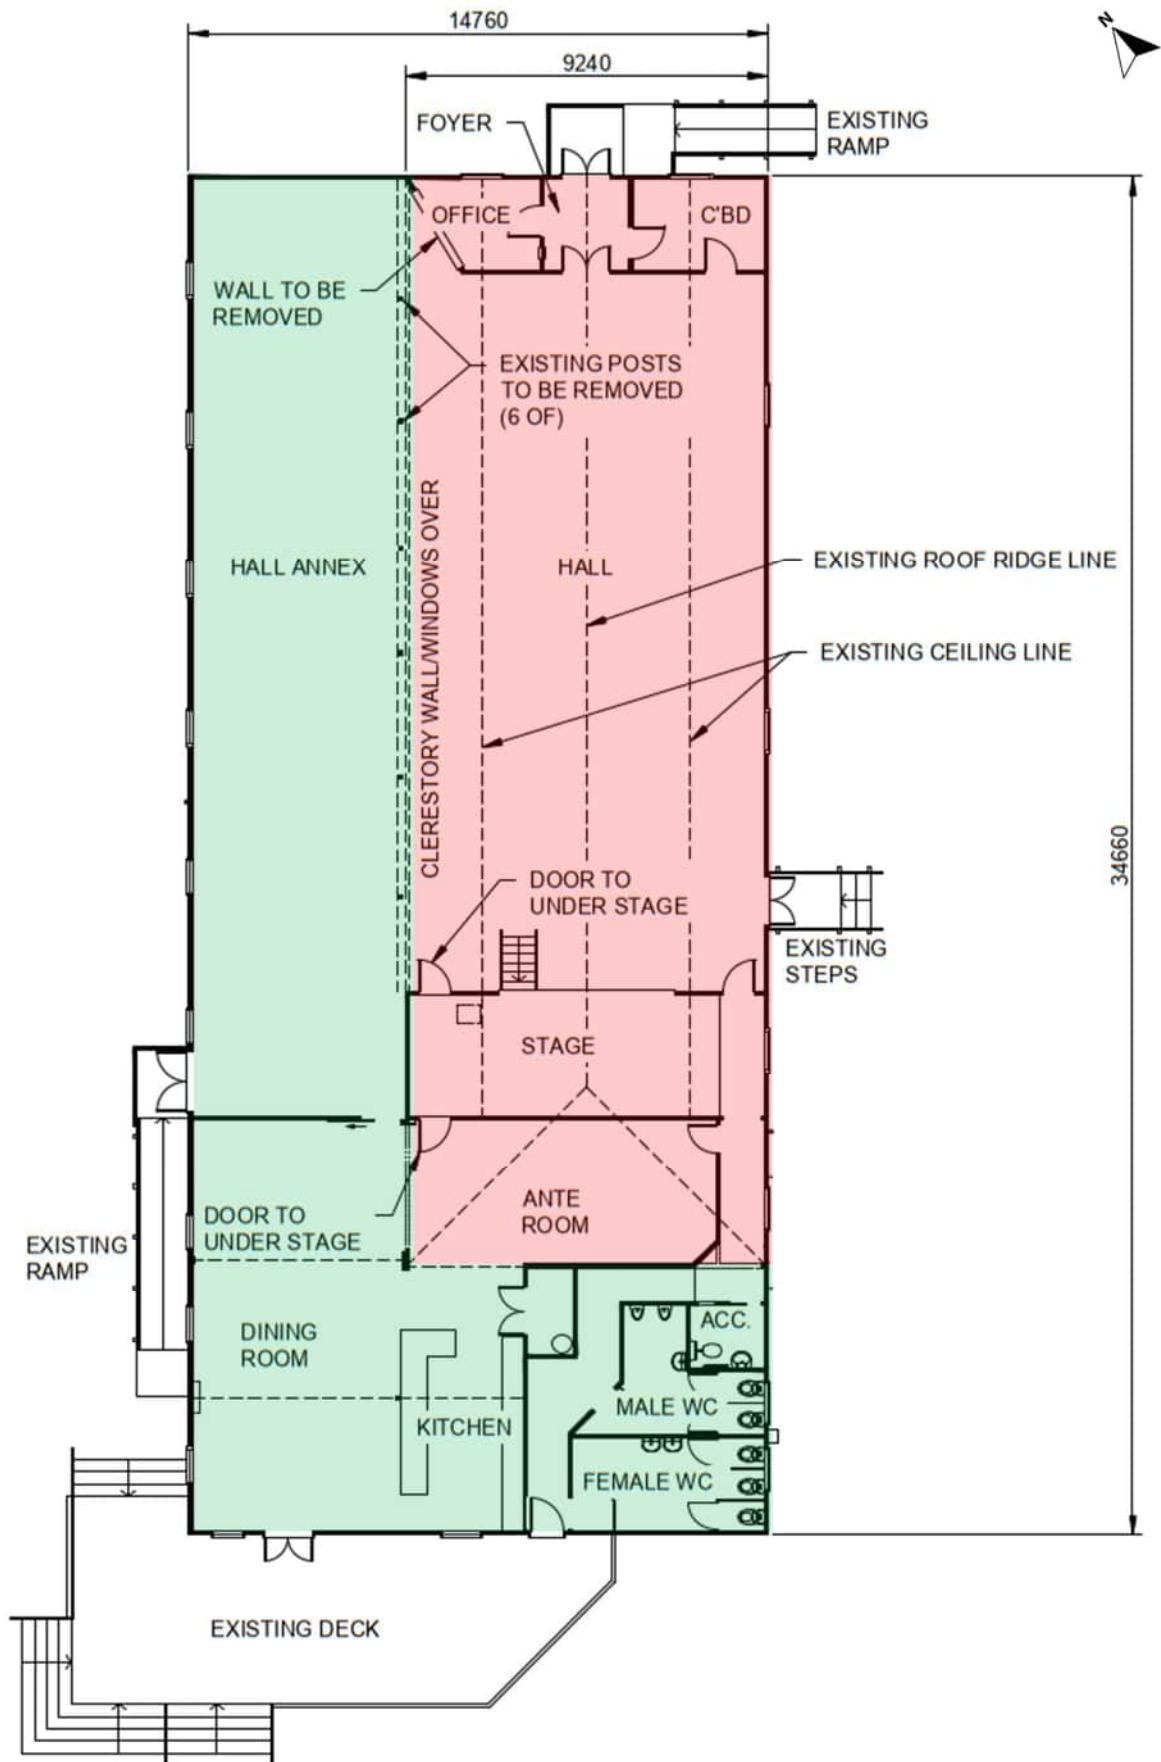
Floor plan of the Te Horo Hall as existing (NTS). The extent of the original building is identified in red, and the extent of 1970s additions is identified in green. The toilets were modified, and ramps added in 2011. Source: Seajay Consultants.
